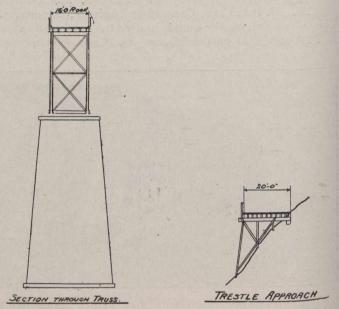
Sections of Abutment and Trestle of New Bridge.
